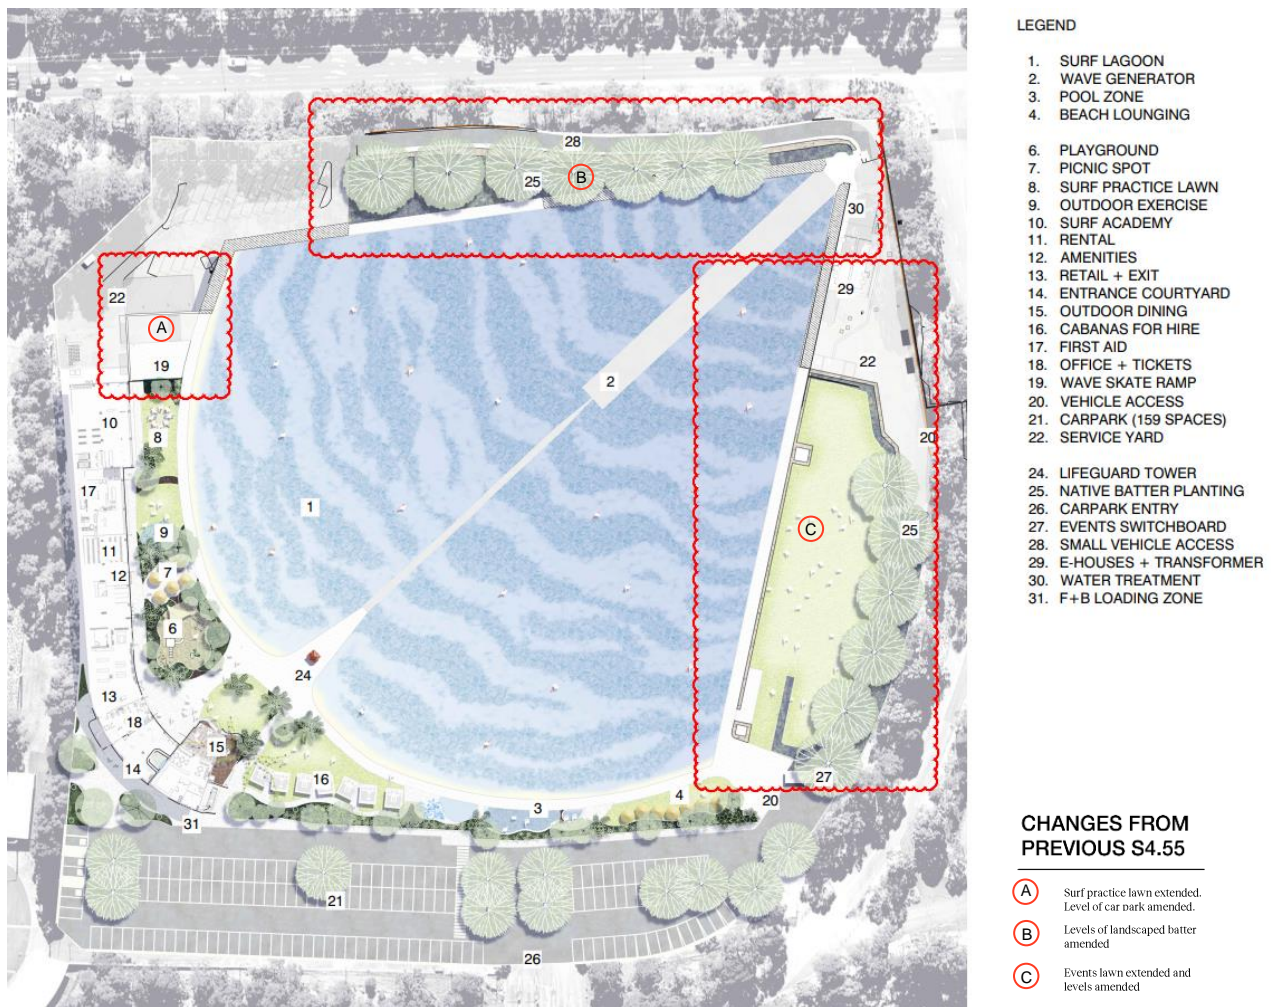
Excerpt from Oculus Landscape Plan Illustrative Masterplan.
